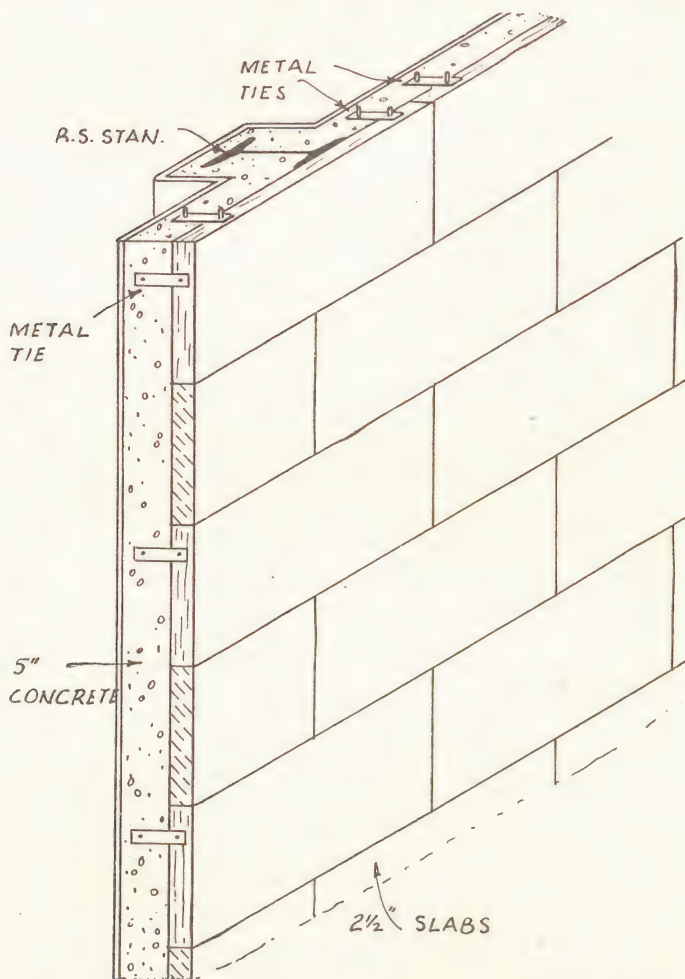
Stone facing slabs secured to concrete backing with metal ties.
